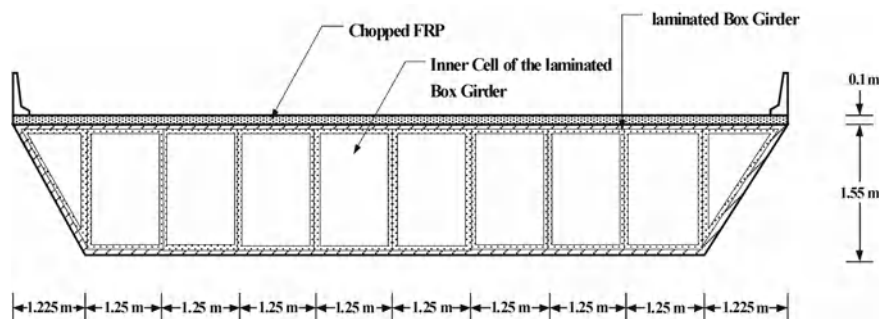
Deck Section of the simply supported advanced composite bridge superstructure sections
